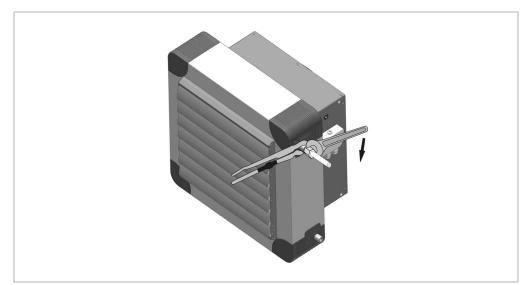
Connecting the medium connection pipe to heat exchanger connections
